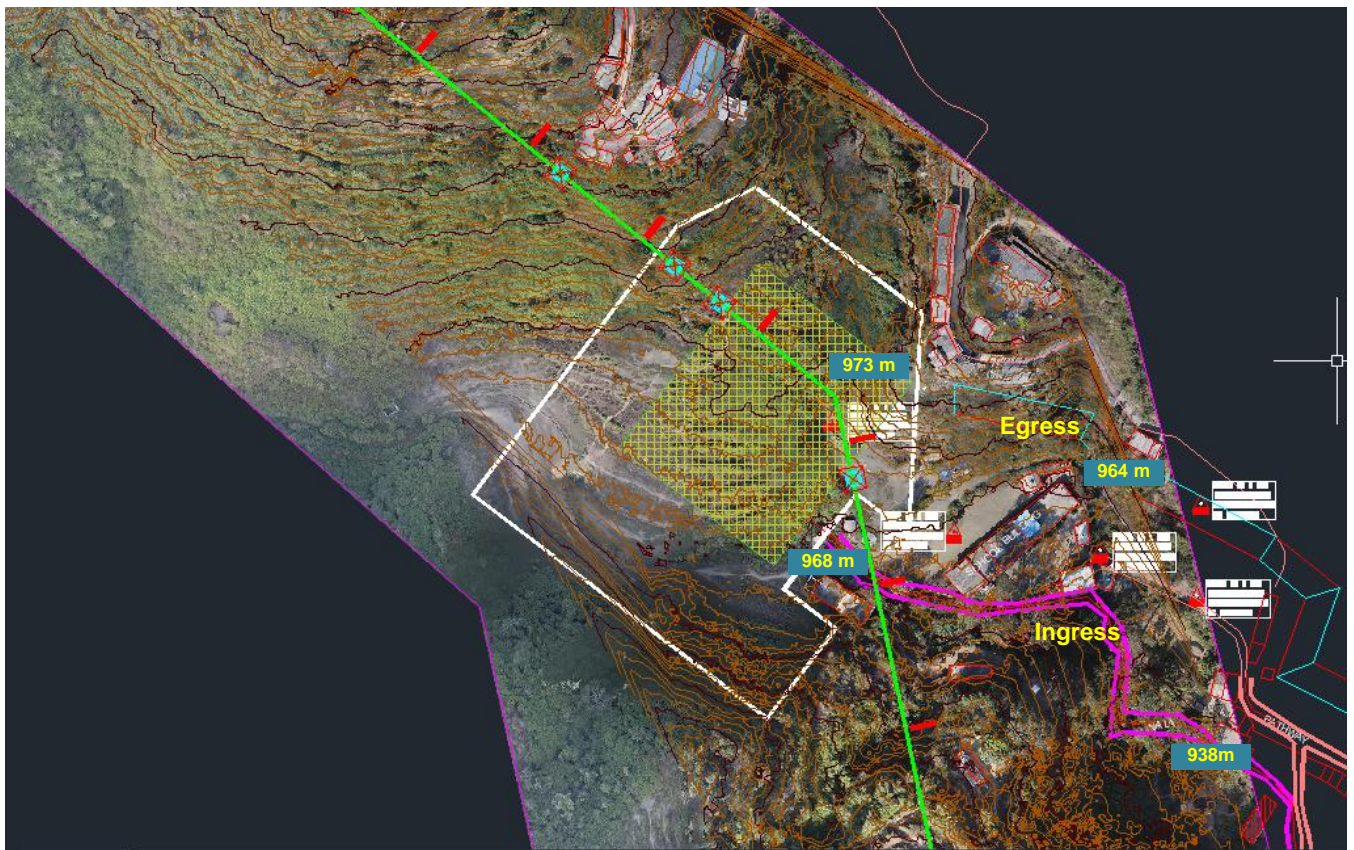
5 Proposed Neelkanth Ropeway Station Location
